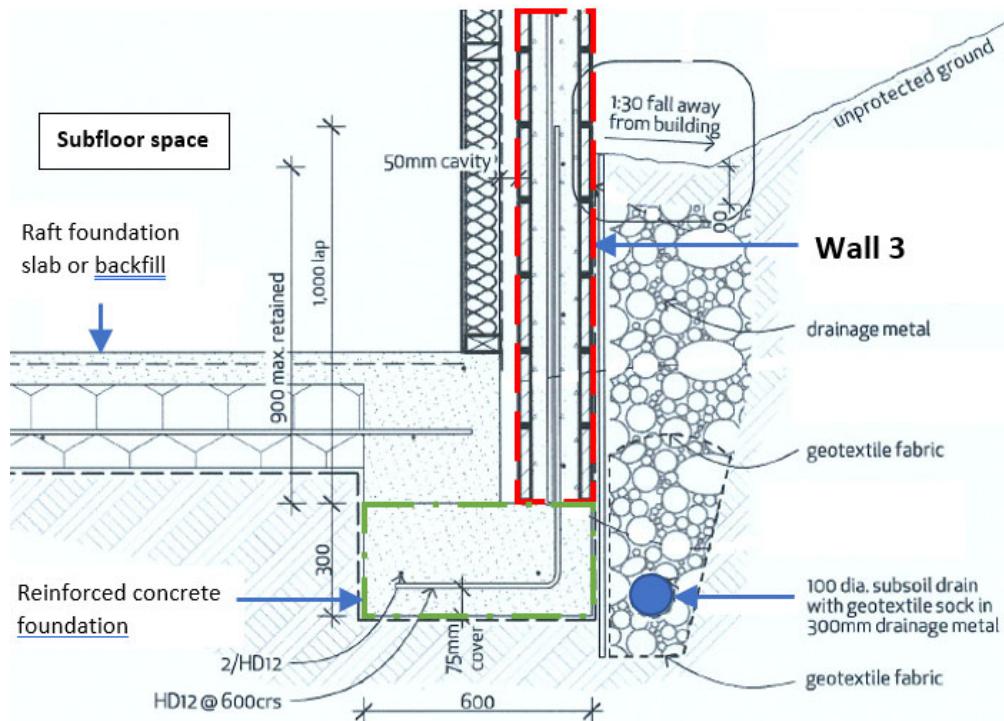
Wall 3 and foundation (not to scale)¹²⁰
